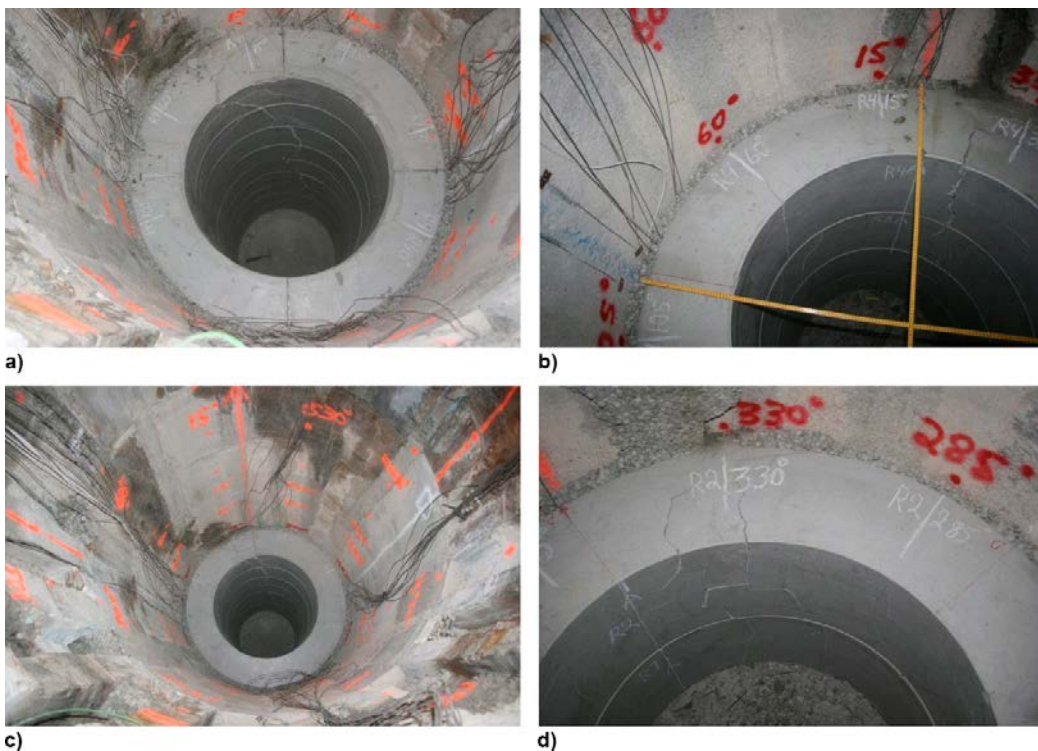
Observed cracks in the ring shaped blocks in position closed to water bearing fractures.
